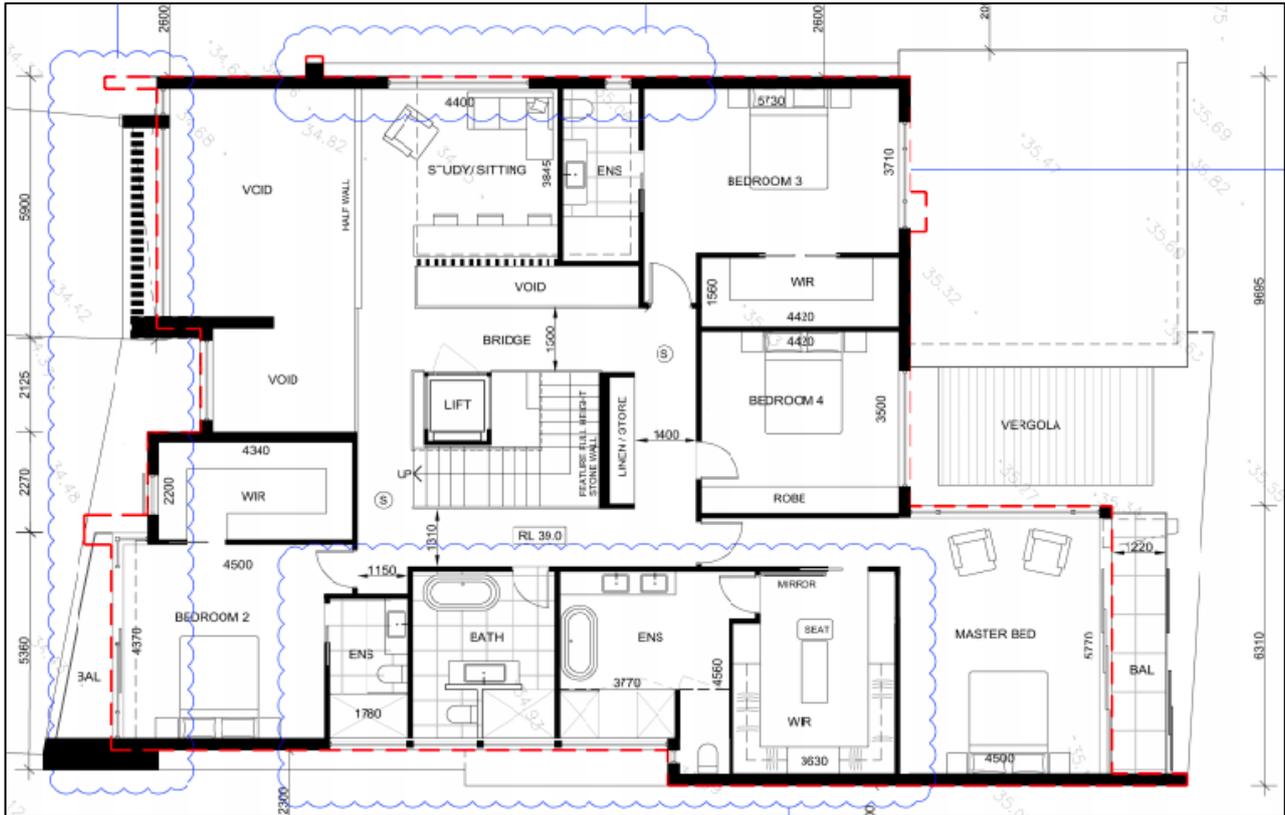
Proposed first floor plan (with modifications outlined in blue)
